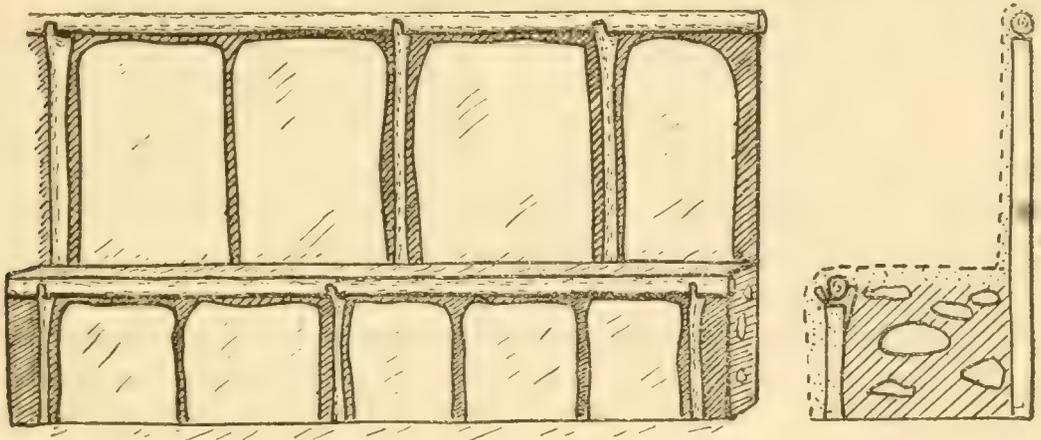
Constructional feature in kiva, showing use of poles in face of bench and back wall
